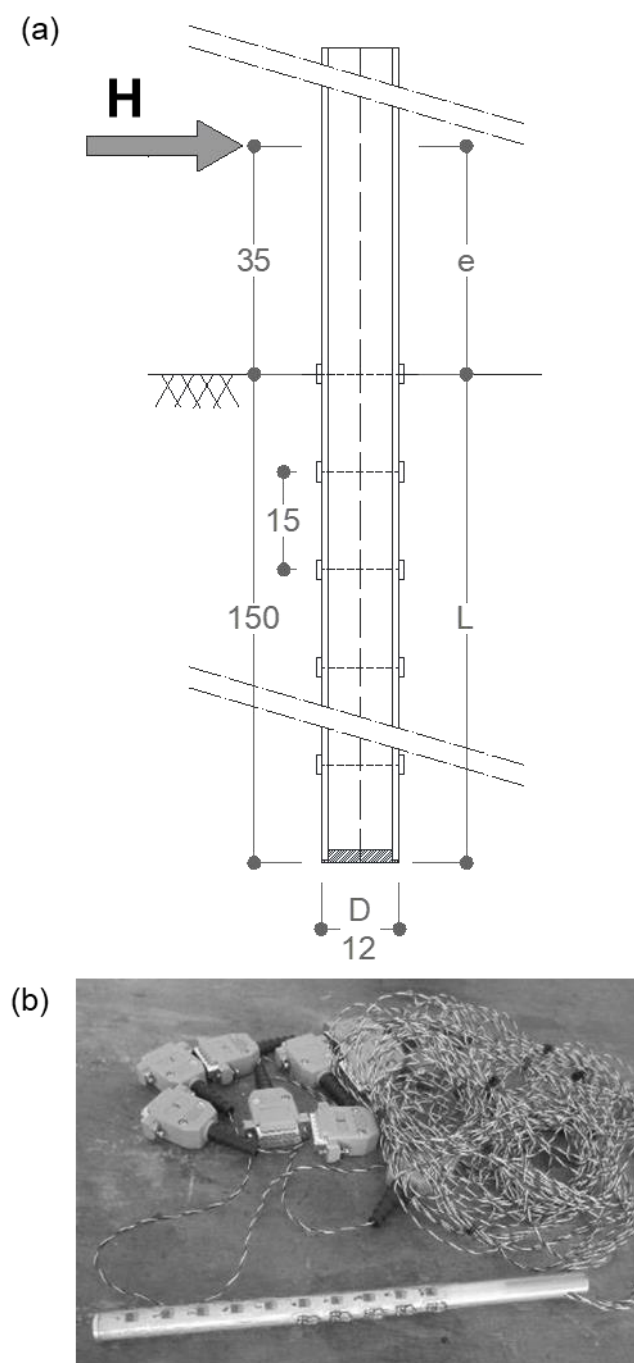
Instrumented model pile: (a) schematic cross section, (b) general view.
